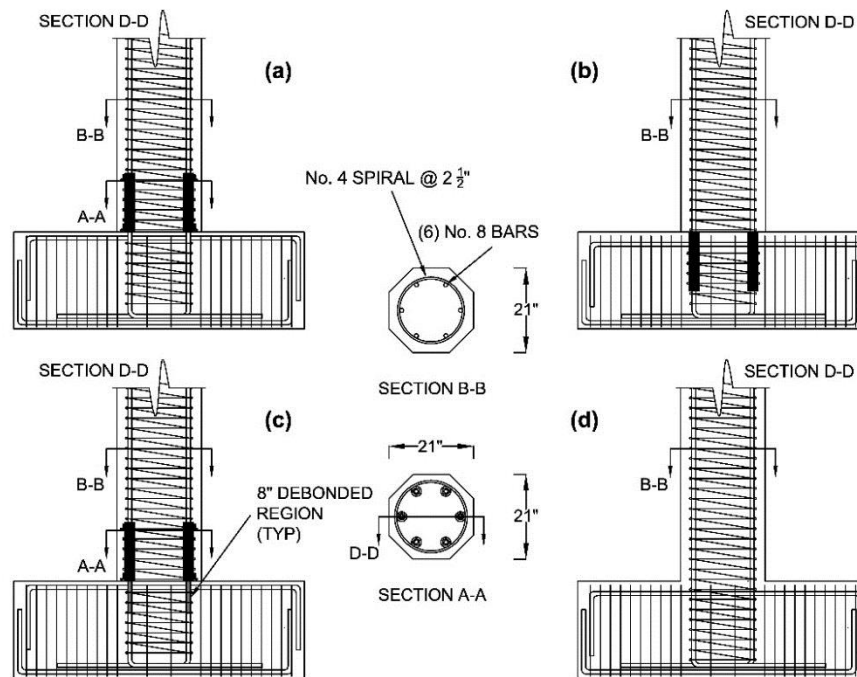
Details for Category I (column-to-footing) specimens: (a) GGSS-1, (b) GGSS-2, (c) GGSS-3, and (d) GGSS-CIP
